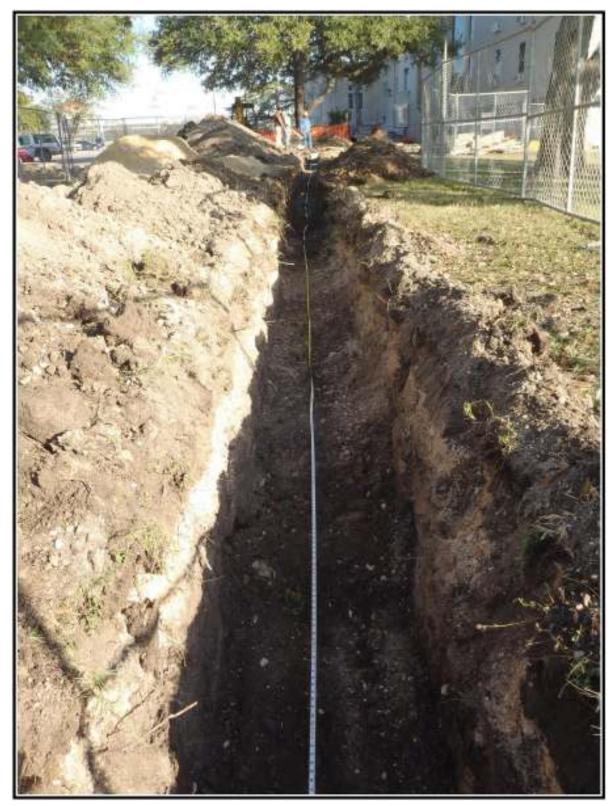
Trench 2 complete (facing east). View from grated drainage gutter towards the Playhouse.
